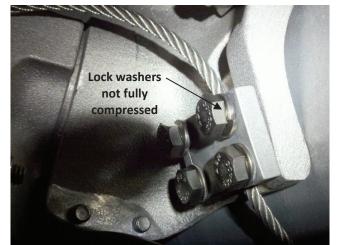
Loose bolts at cable clamping connection to orbital bracket
